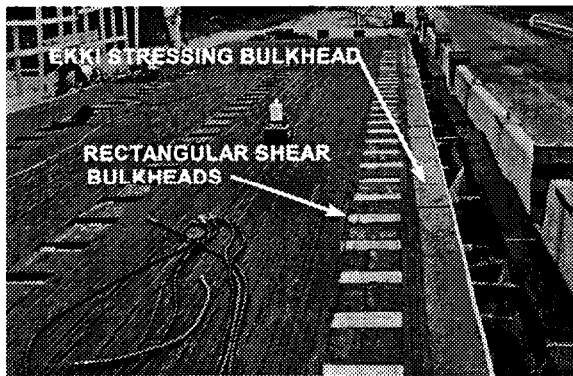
First Stage of deck prior to stressing. Note Ekki stressing bulkhead on right and rectangular shear bulkheads in deck.
